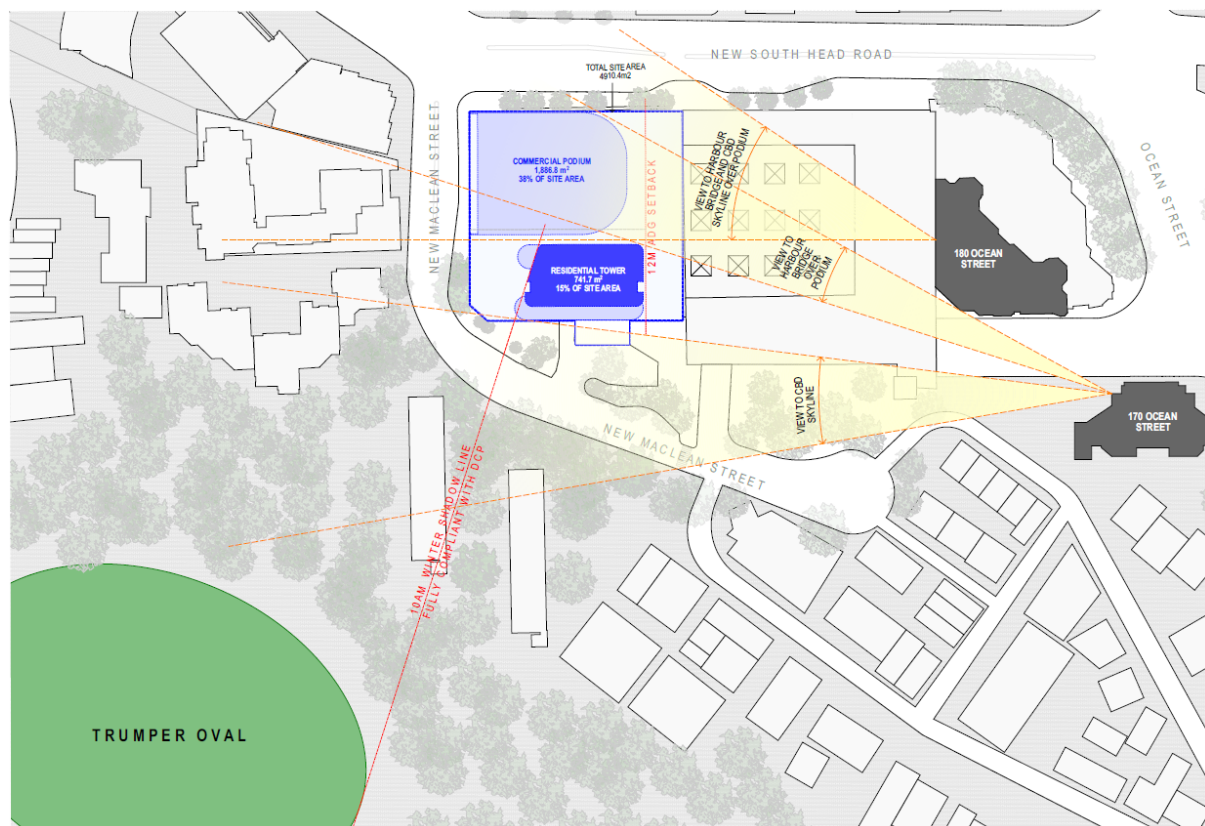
Site plan outlining the wider environmental considerations of the proposal.
